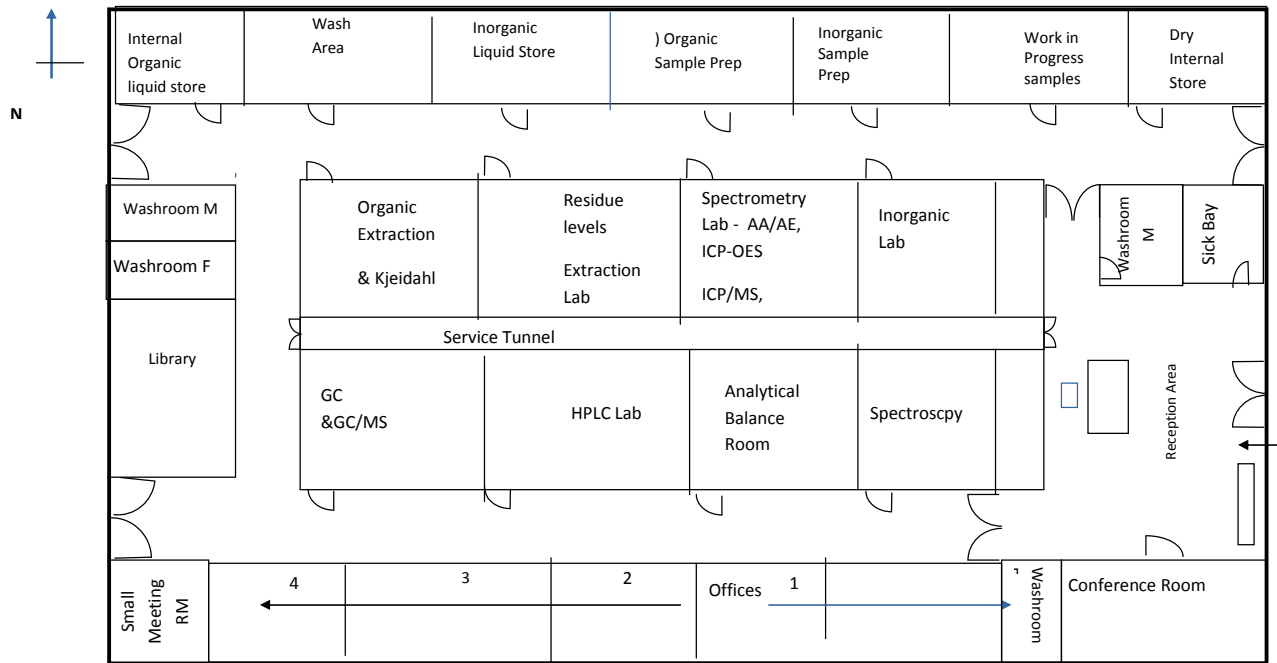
CONFIGURATION 1d (details): LAYOUT OF THE CHEMISTRY LABORATORIES - GROUND FLOOR
